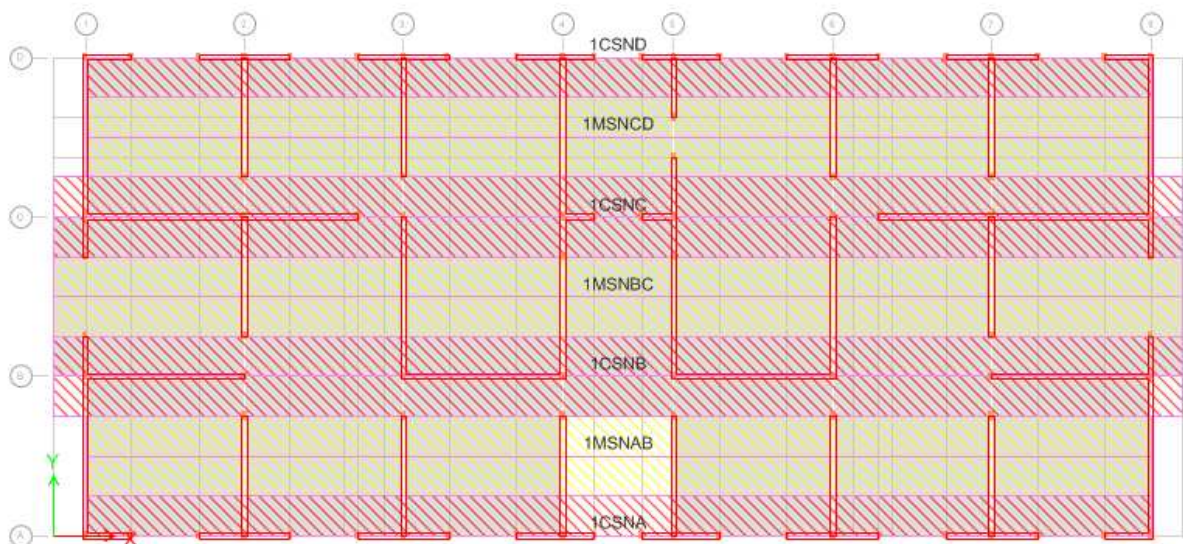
Plan of the slab with the strips. Layer A. 1st floor
